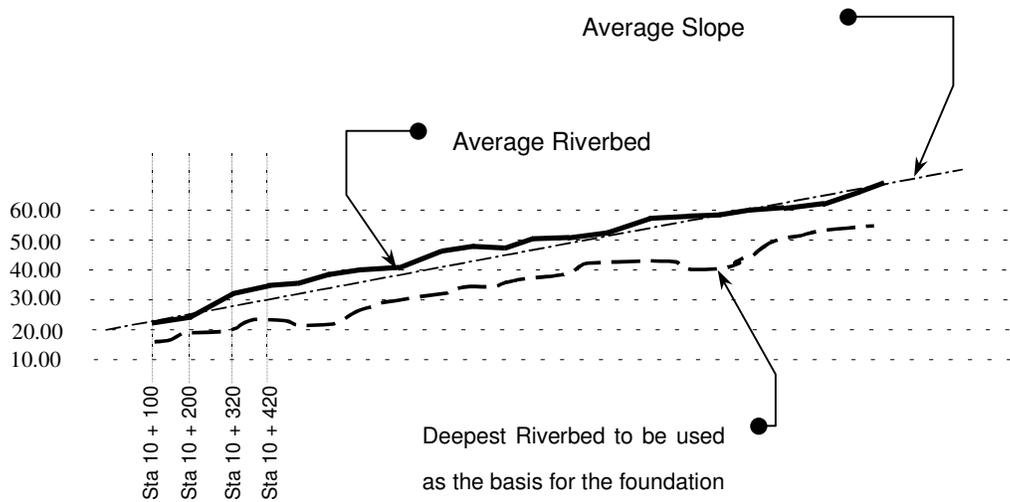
Profile of Riverbed Elevation and Average Slope (Example)
